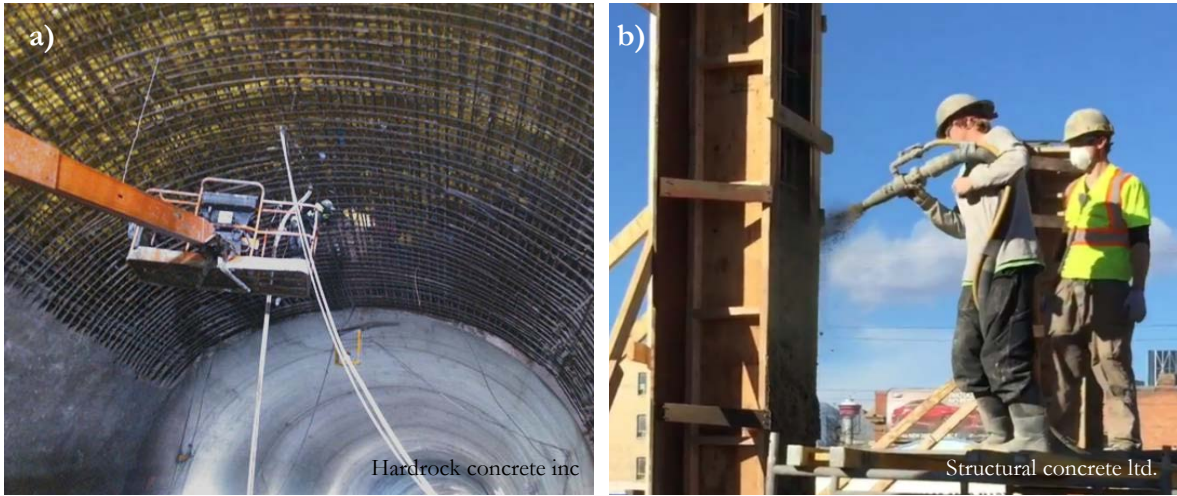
a) Tunnel lining and b) columns being sprayed with concrete
